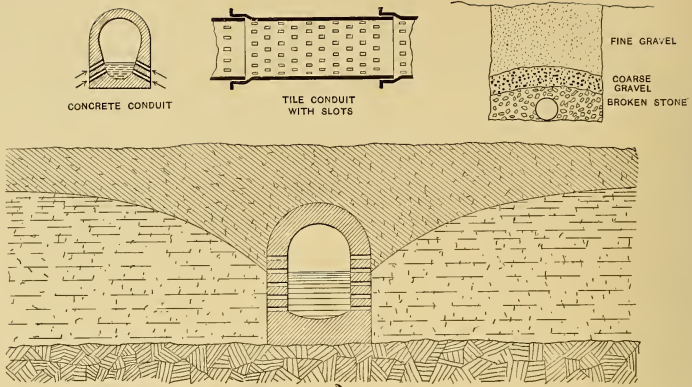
COLLECTION OF UNDERGROUND WATER THROUGH A BRICK COLLECTING GALLERY
